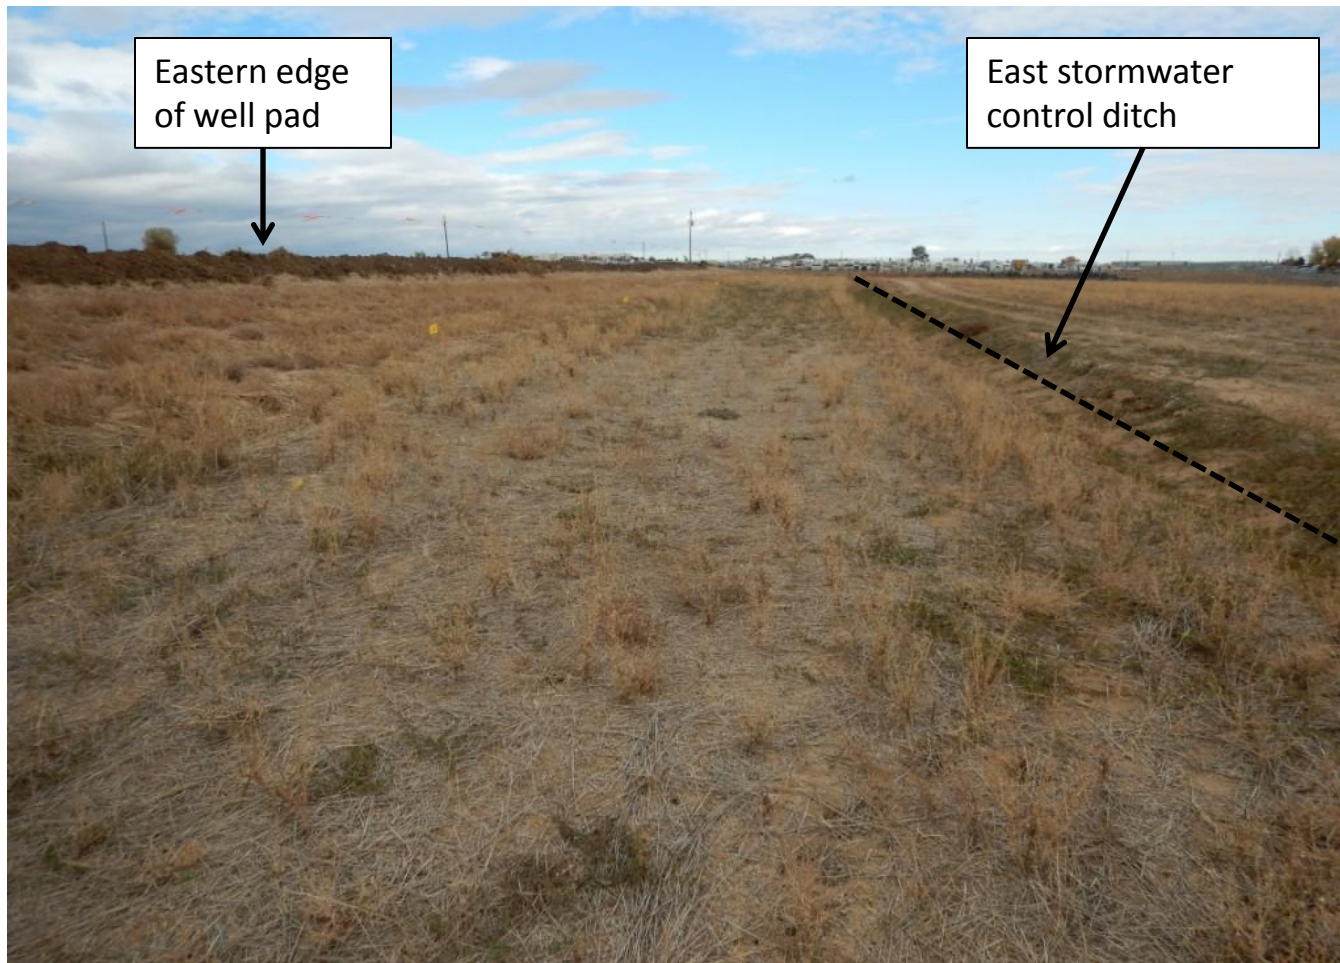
Photo taken from east location, facing North. Need to reclaim and minimize areas where production or facilities are no longer necessary.
